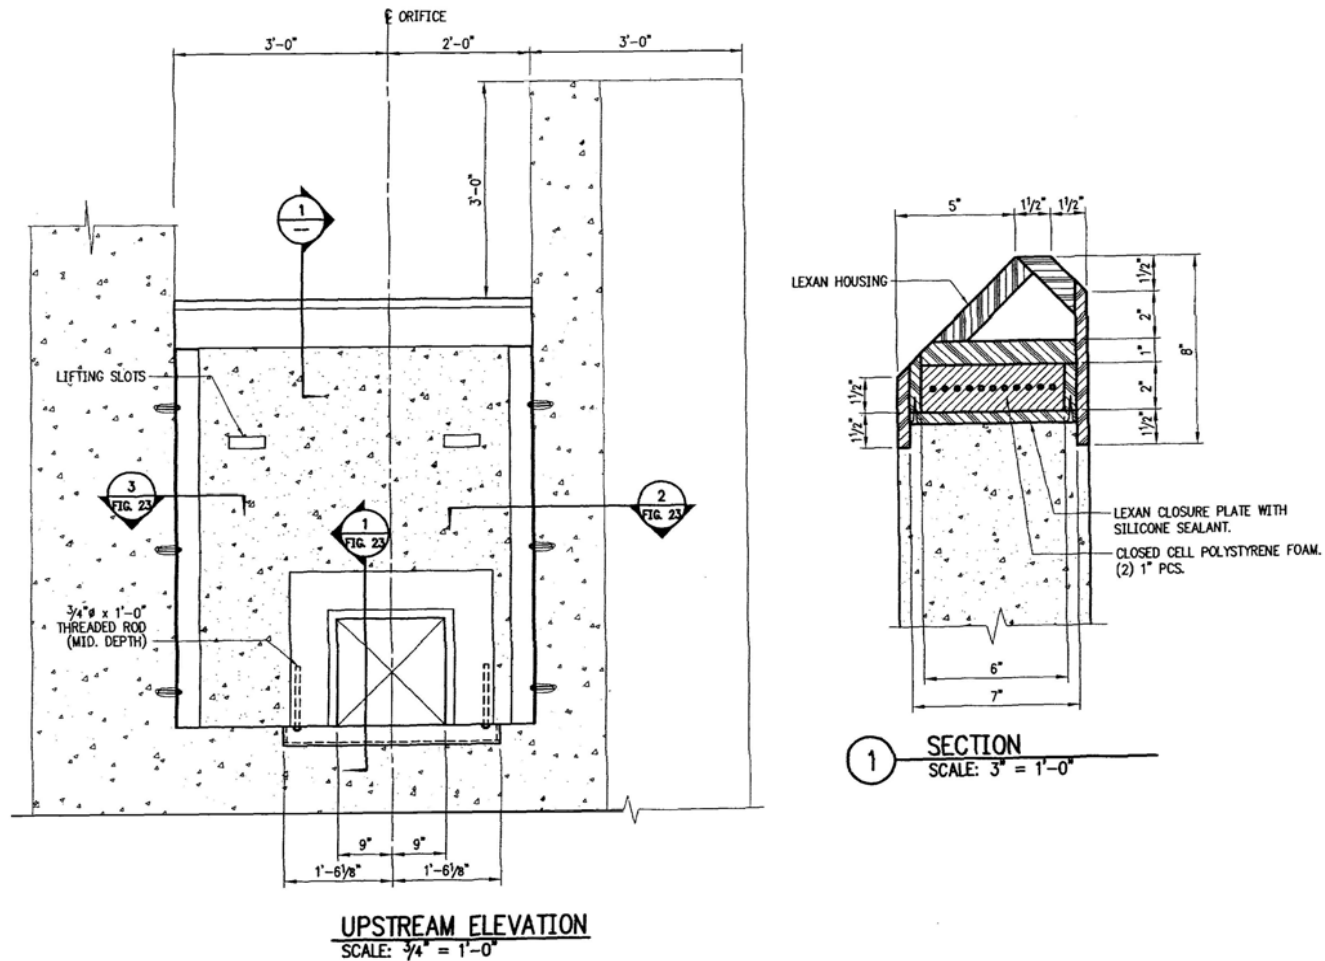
Office/Weir Antenna Housing - Elevation and Section (Fiberglass Reinforced Concrete)
